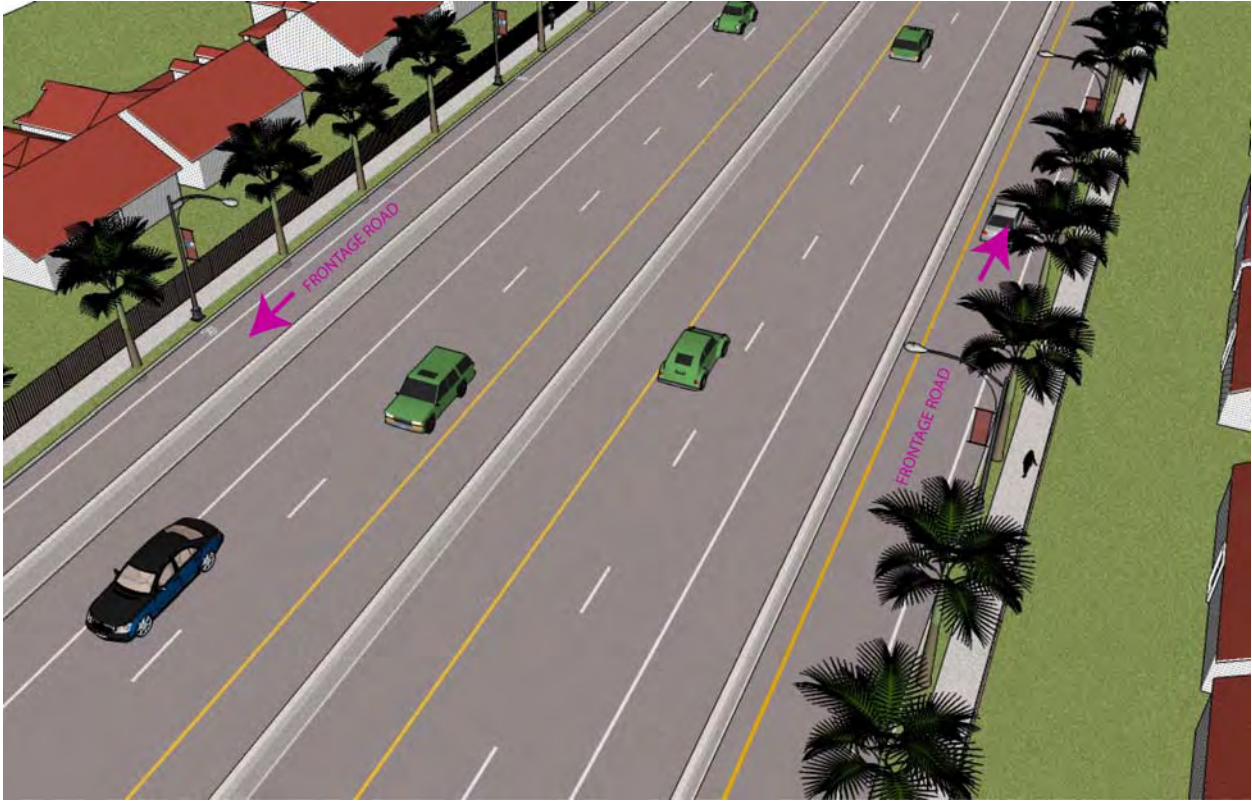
Illustration 2: Alternative 2 – SW 136<sup>th</sup> Street Limited-access Facility
